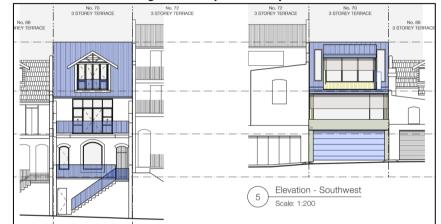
Proposed northeastern (left – Carabella Street) and southwestern (right – Crescent Place) elevations.
